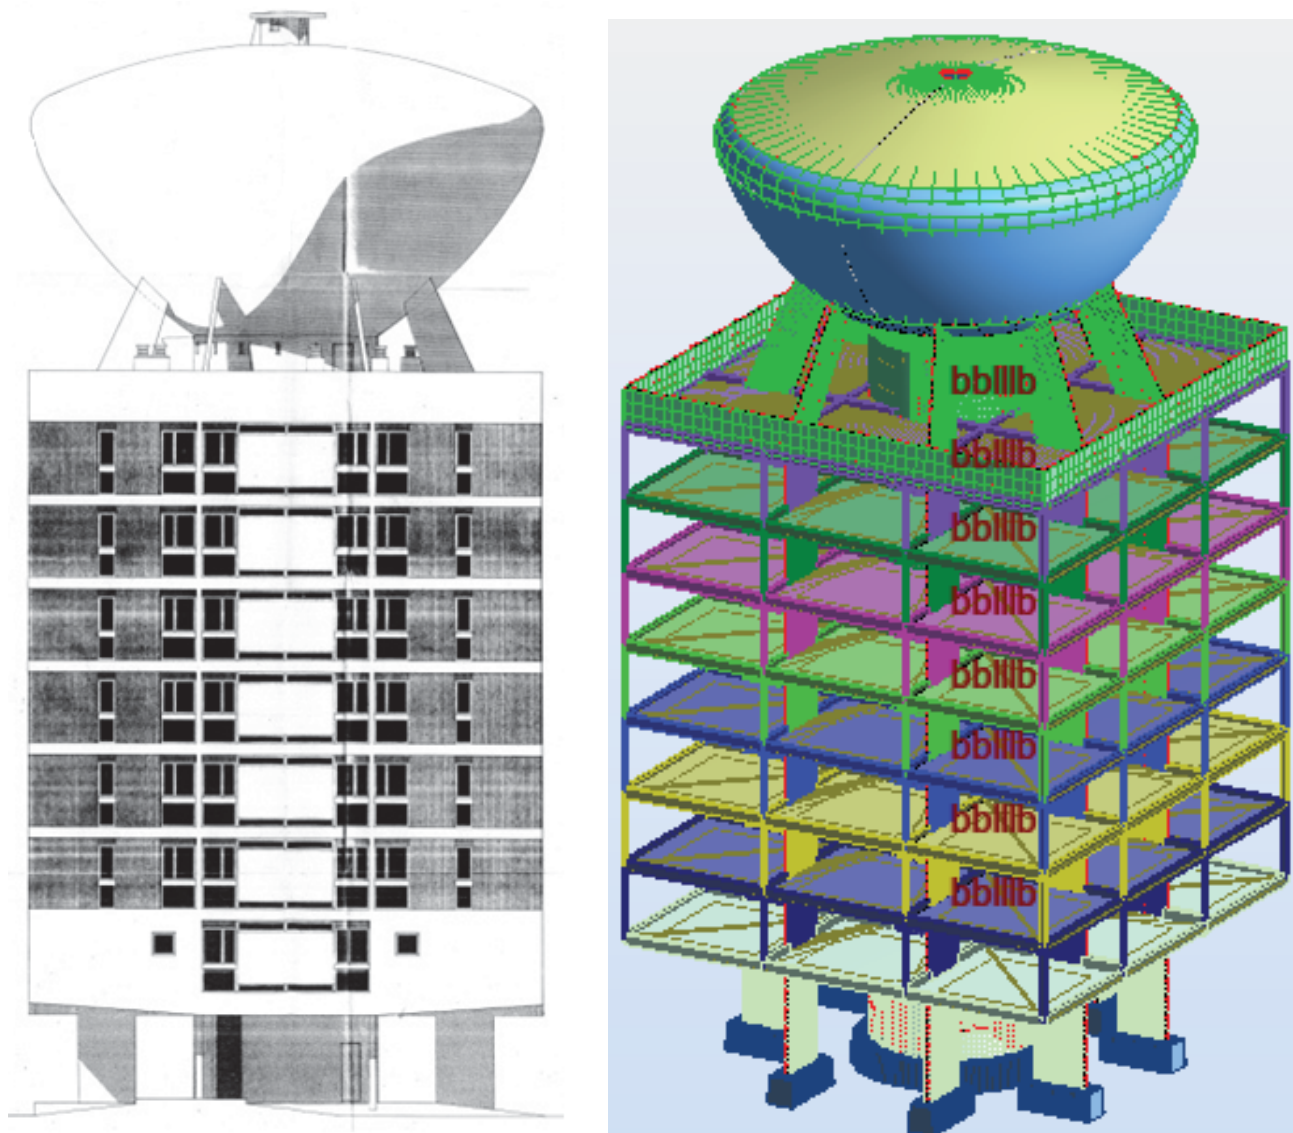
General view and longitudinal cross section of the building-tank [5]
